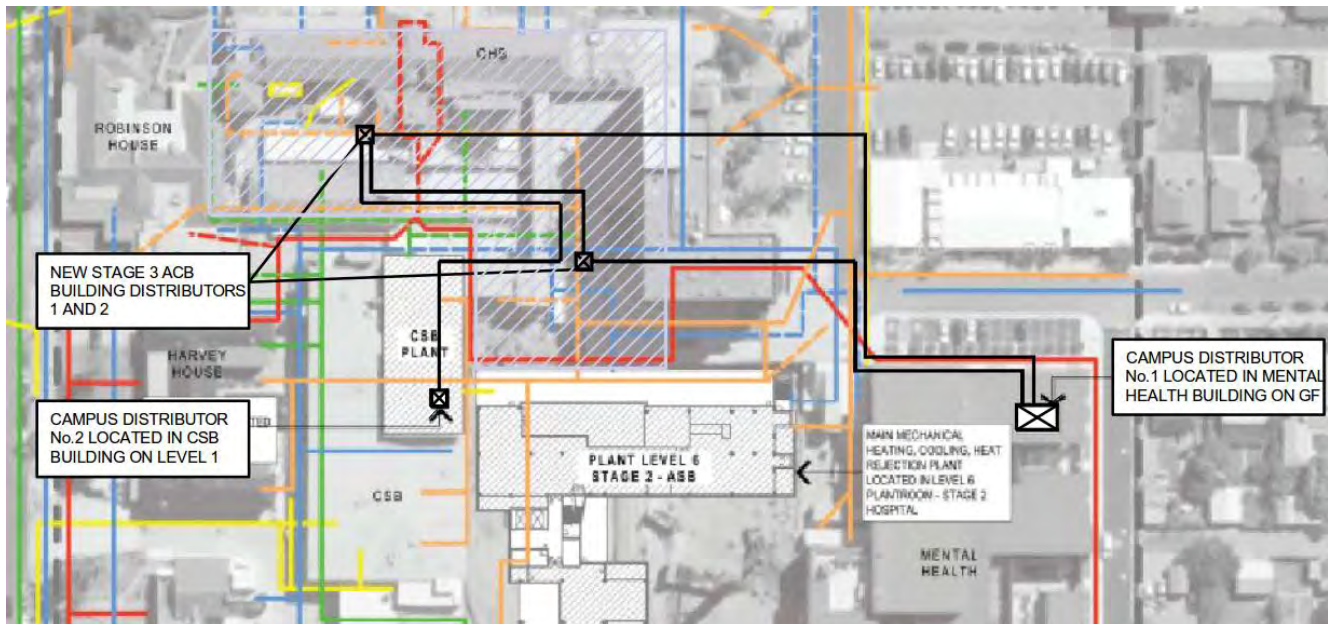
Proposed ICT site infrastructure cable routes relevant to the connectivity of the Stage 3 ACB
